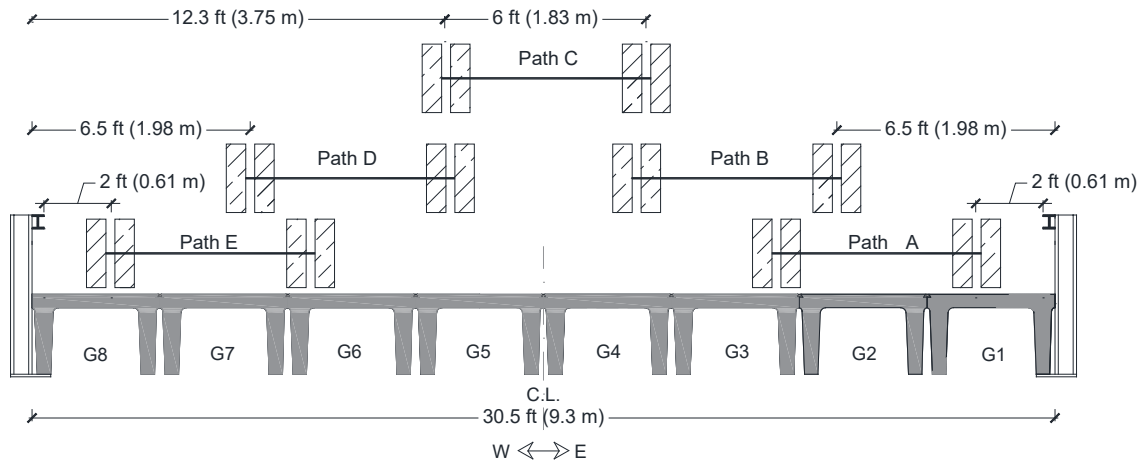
Field Test Truck Paths for 23-in. (584-mm) Deep Double-Tee Girder Bridge
